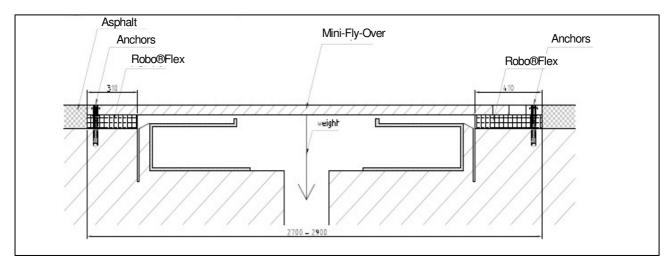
Construction Step 2: Removal of existing joint and installation of Mini-Fly-Over
